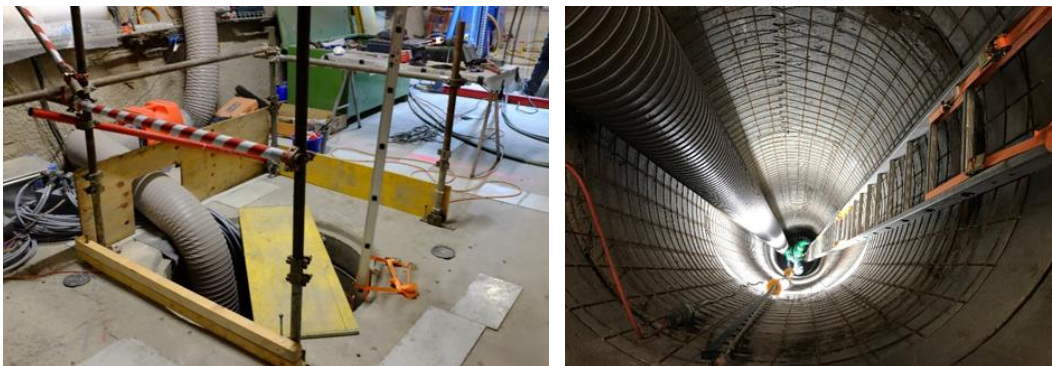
Safety installations including steel mesh lining, ventilation, illumination and access ladder (Photos by D. Jaeggi, swisstopo)
